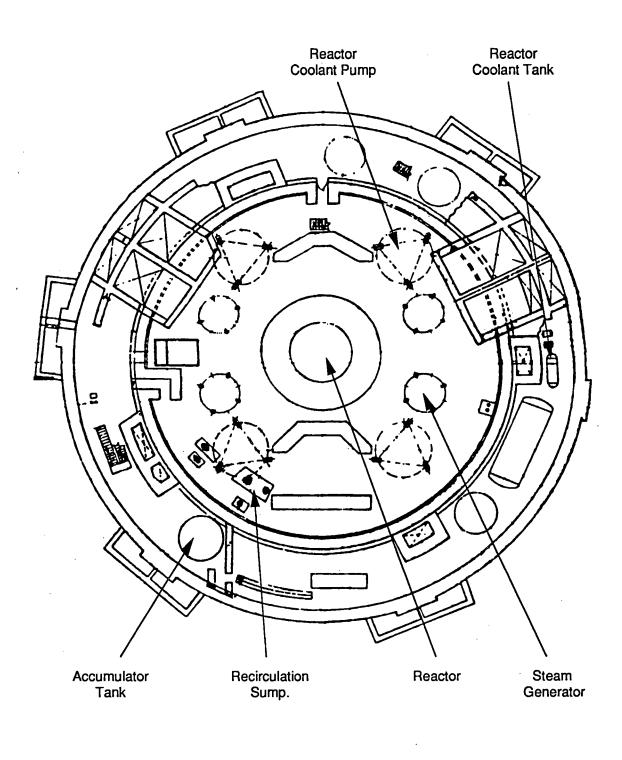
Zion 1 Containment, Elevation 560'0"
